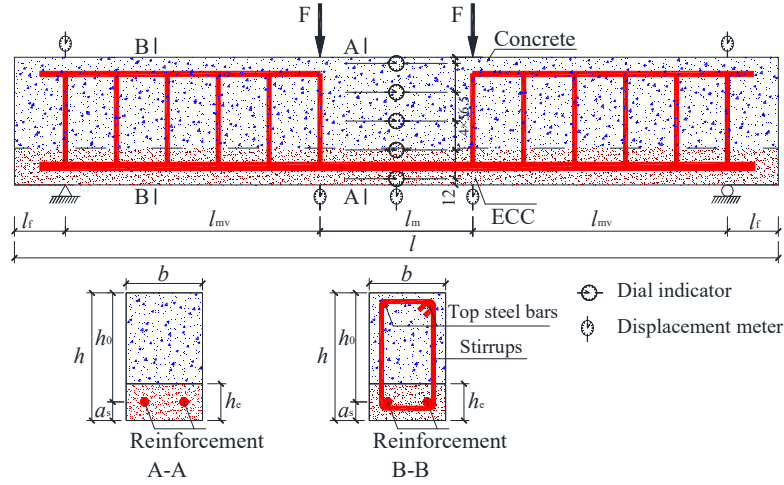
Schematic diagram of reinforced ECC-concrete composite beams
